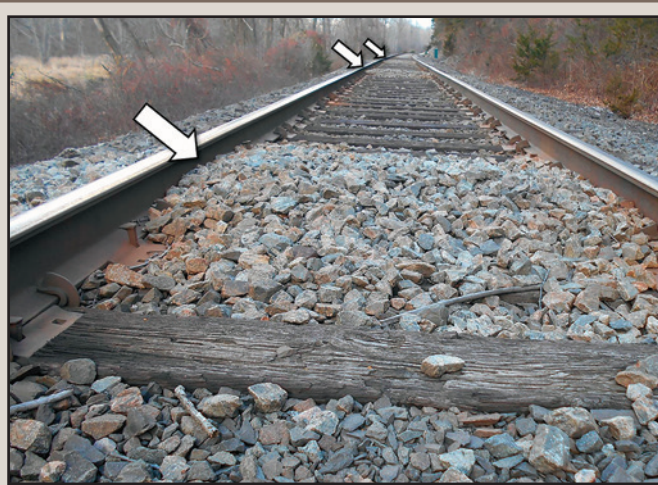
Ballast ramps constructed along the Metro-North Railroad to facilitate the escape of turtles that become trapped between the rails. White arrows denote ballast ramps (note additional ramps in the distance).
